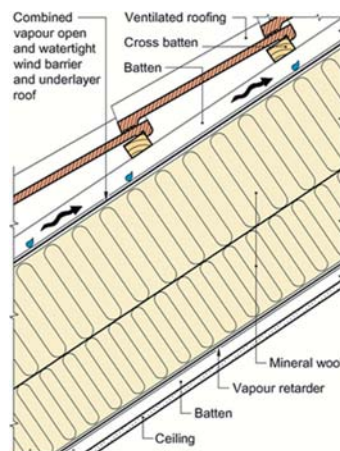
Roof Type B, which is an insulated pitched wooden roof with vapour open combined wind barrier and underlayer roof. All ventilation of the roof takes place in the air cavity below the roofing [13].
